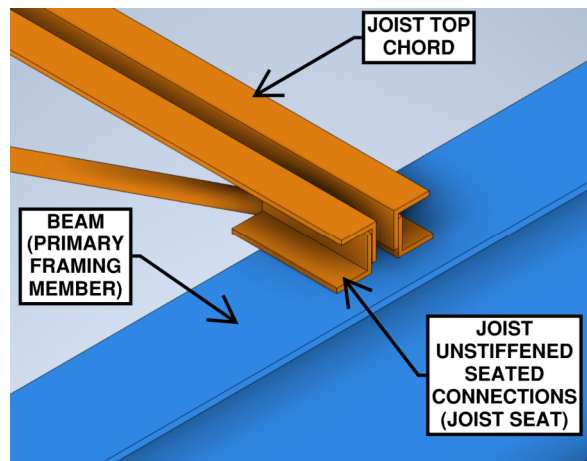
Typical Joist Unstiffened Seated Connection
